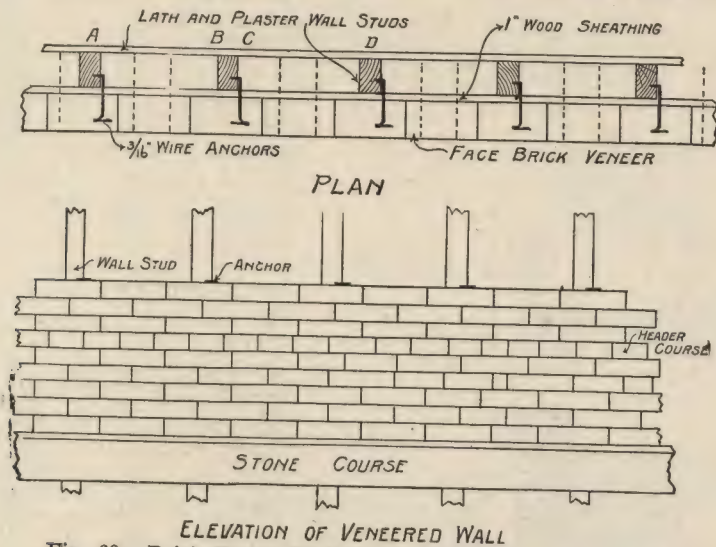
Brick Veneer Wall Construction, Showing Bonding.
